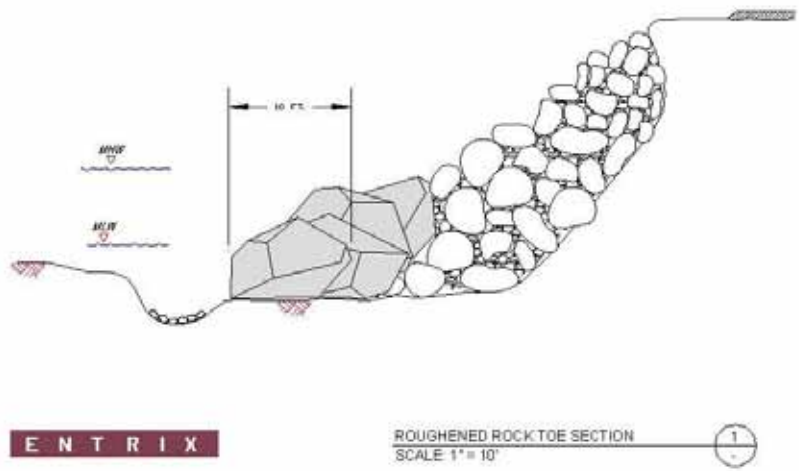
(A Itemates 1 and 2) Rock Toe Protection at Existing Retaining Wall, with 8 to 10 foot diameter boulders below, and 2 foot diameter rip-rap stone up to half the height of the wall.
